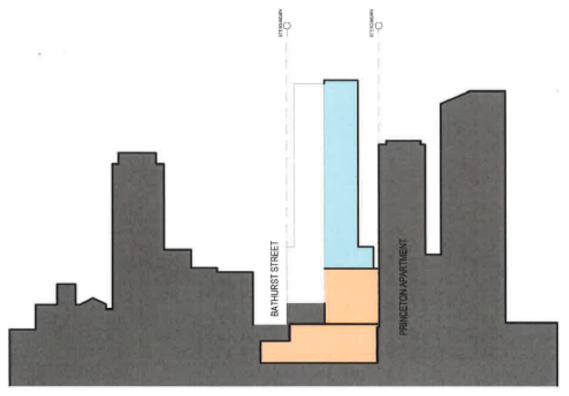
Pitt Street South Concept SSD DA – Building Section
